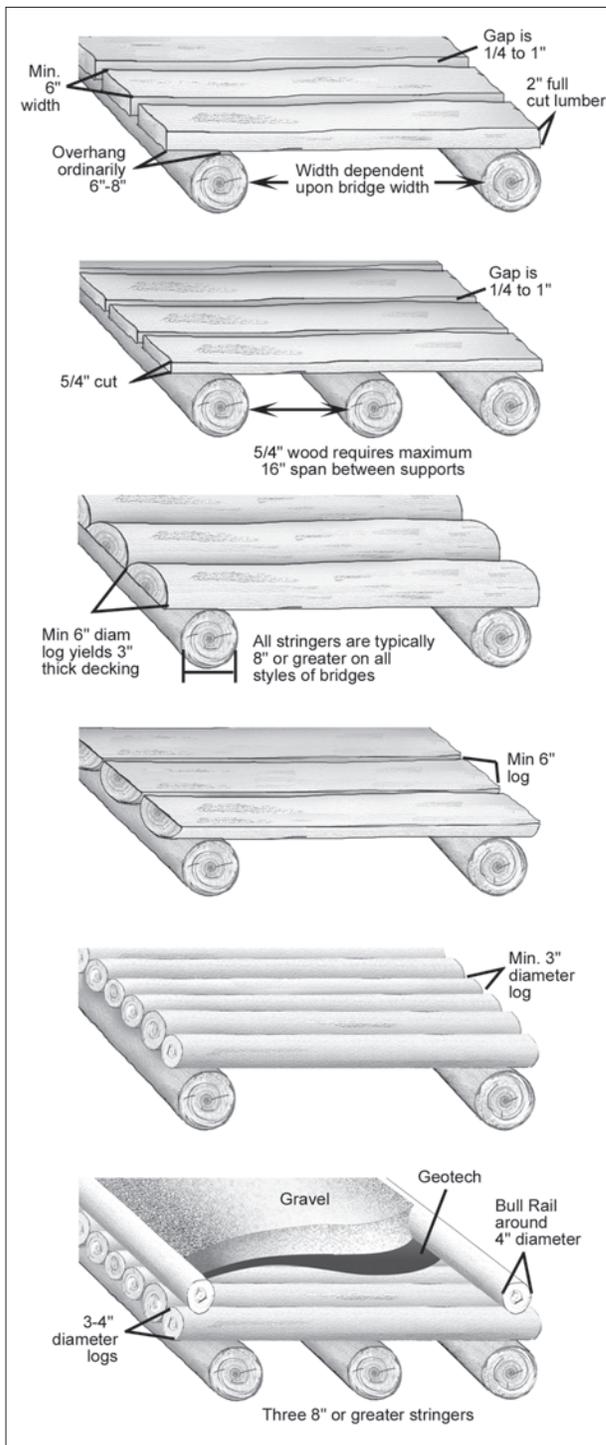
Examples of alternative bridge decking characteristics that reflect CCC era bridges. (Acadia National Park, Barter and Baldyga)
